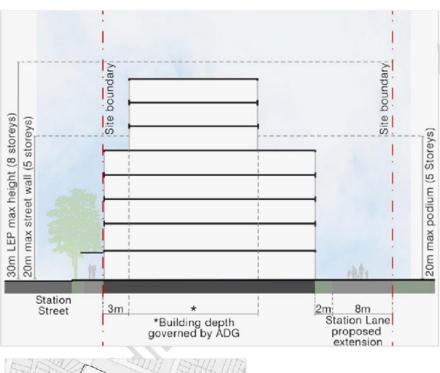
Station Street East / Lane Street Precinct - typical east west section
